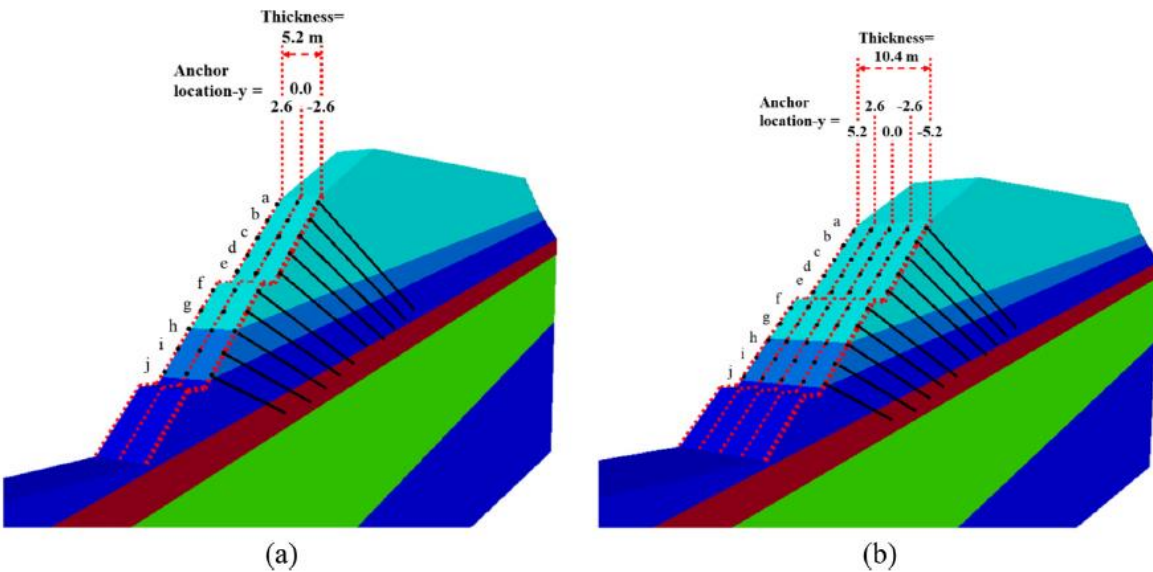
3D slope models (a) 3-column ground anchors (b) 5-column ground anchors.
